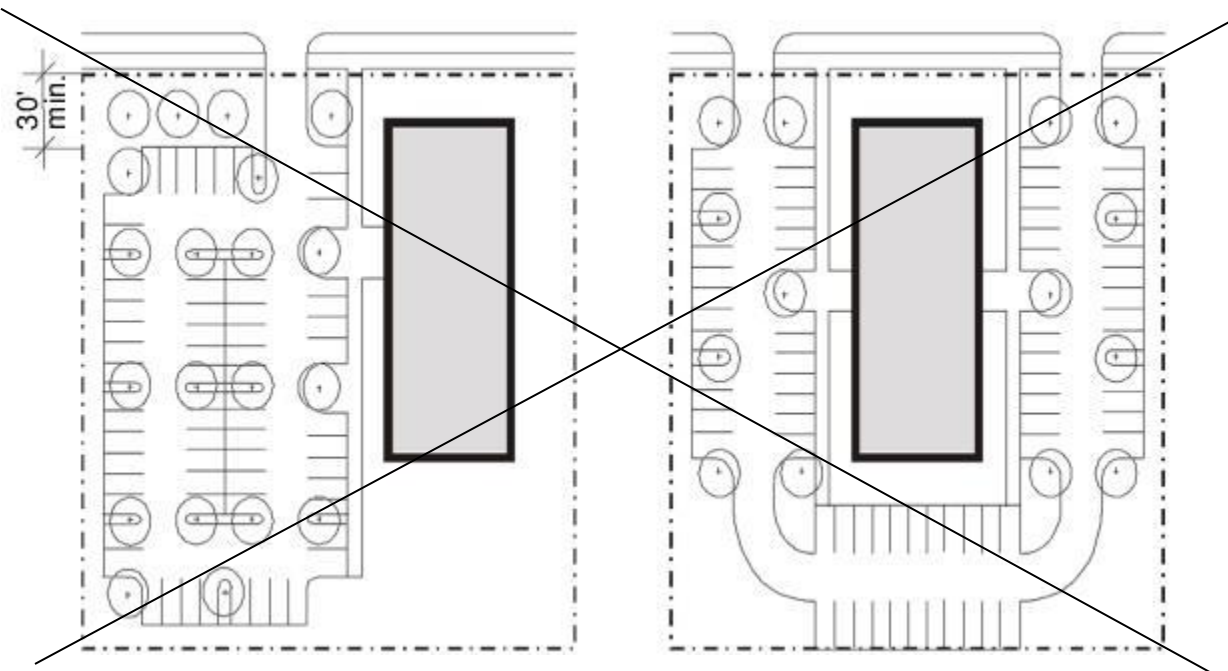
Figure Exception to 20.50.140(E): A consolidated parking scheme (left) with more than 30 spaces may be permitted if it is buffered from the street and produces improvements from a separated parking scheme (right), such as a better open space layout, fewer curb cuts, etc.
